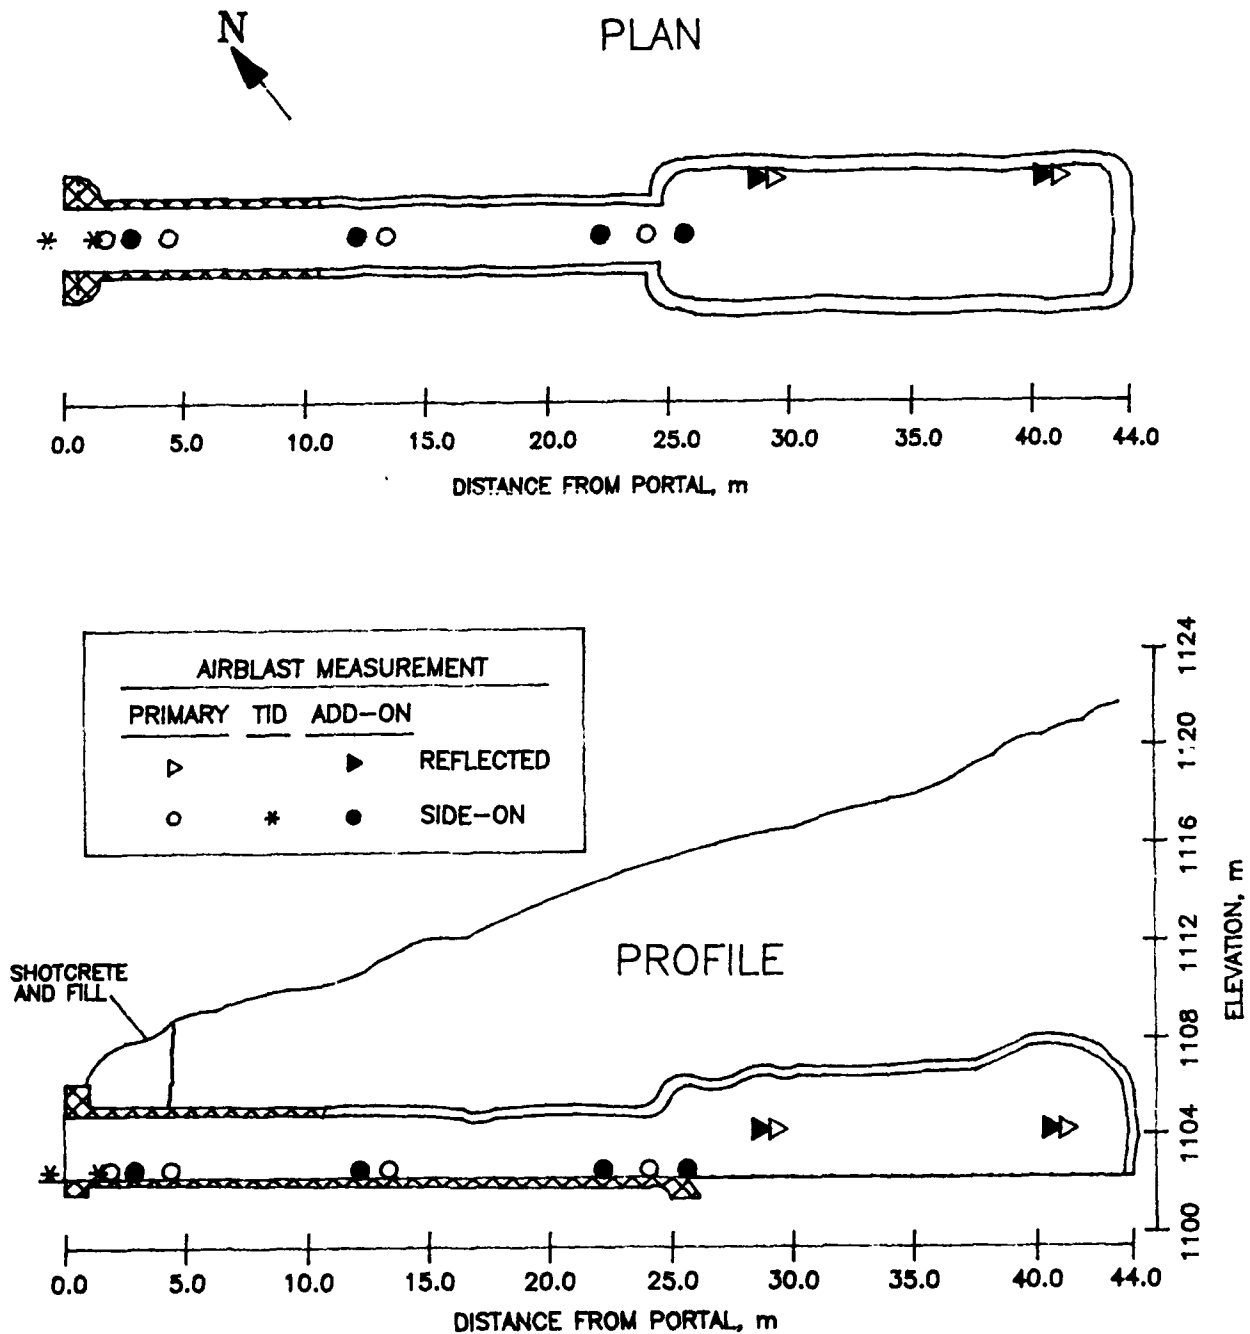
Interior pressure transducer locations for Shallow Underground Tunnel/Chamber Test Program.
